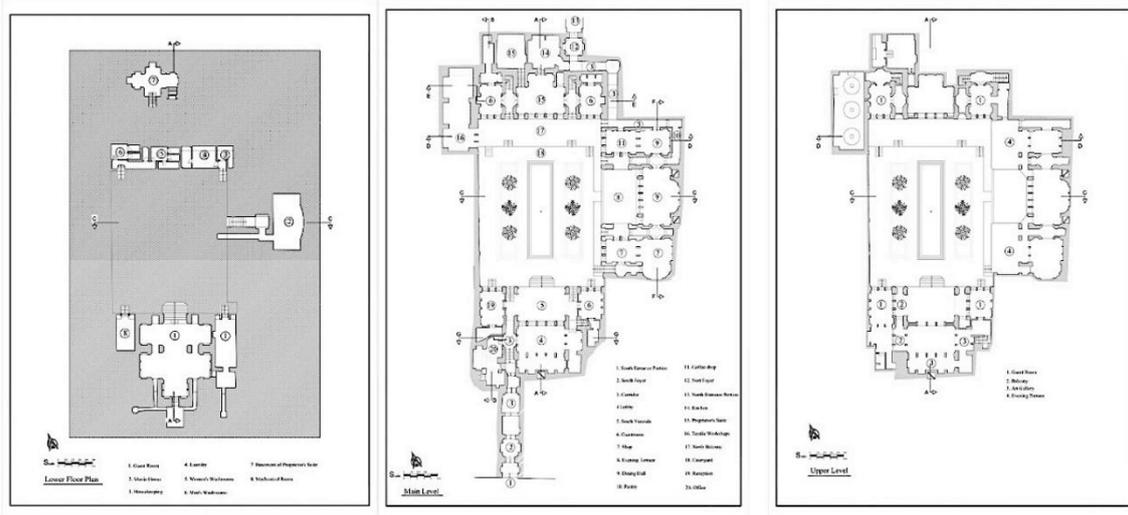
Manouchehri House's basement, first floor and second floor plan ([Eshrati et al., 2017](#))
